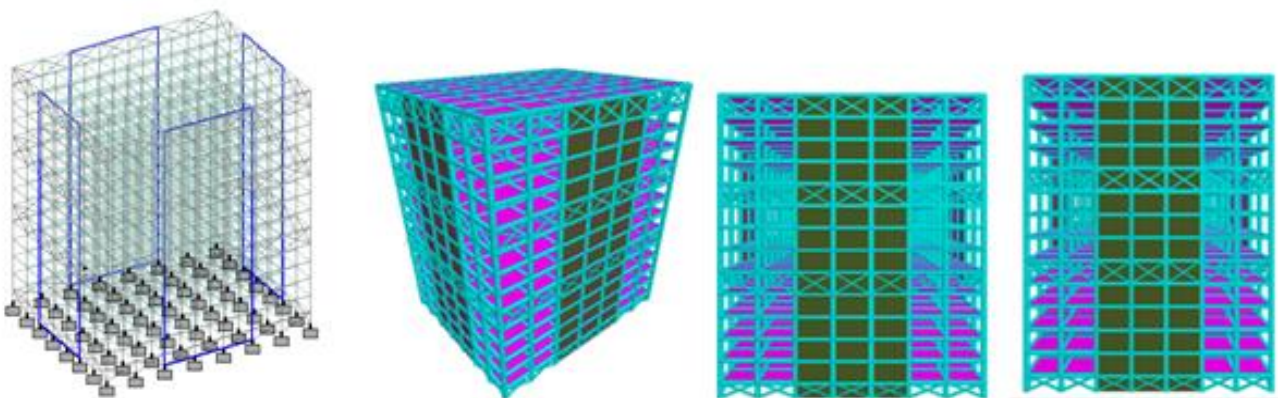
Structure With Belt Truss And Outrigger Introducing With Shear Wall.
